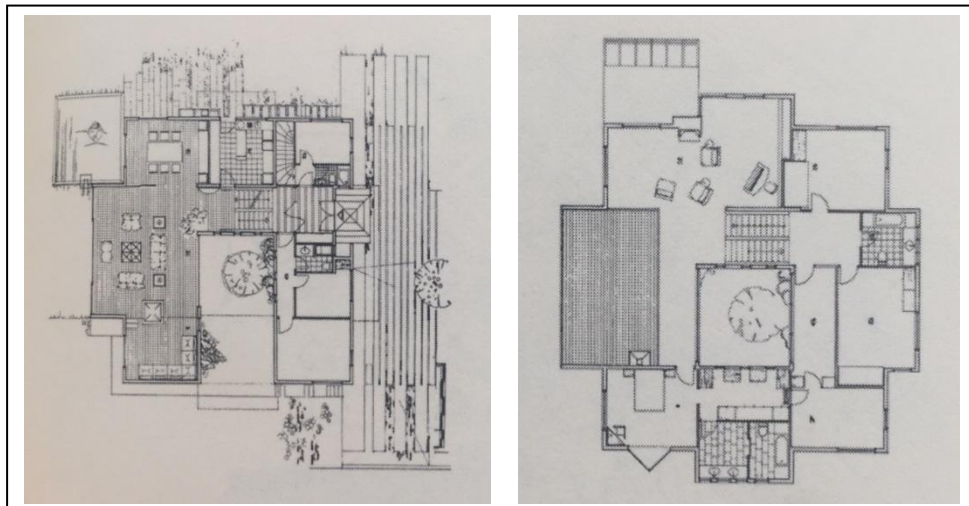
Floor plans of Zeytinoğlu house [80]
